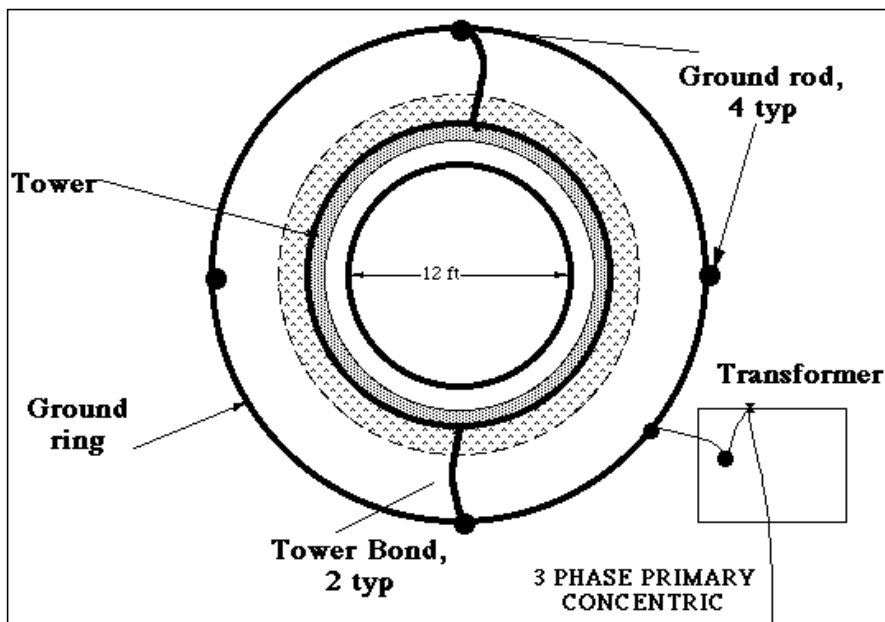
V-47 and V-66 foundation grounding schematic at Big Spring, Texas
